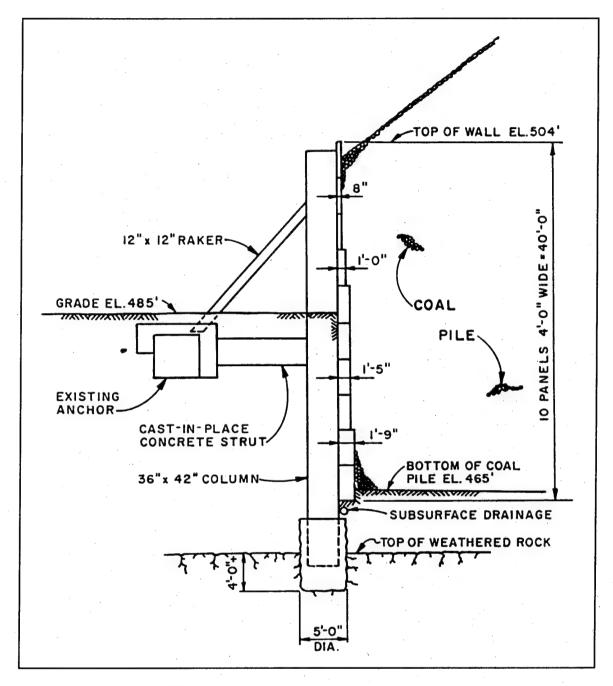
Typical precast panel section for Wall A at Indiana Power & Light coal storage facility (from PCI 1985)
